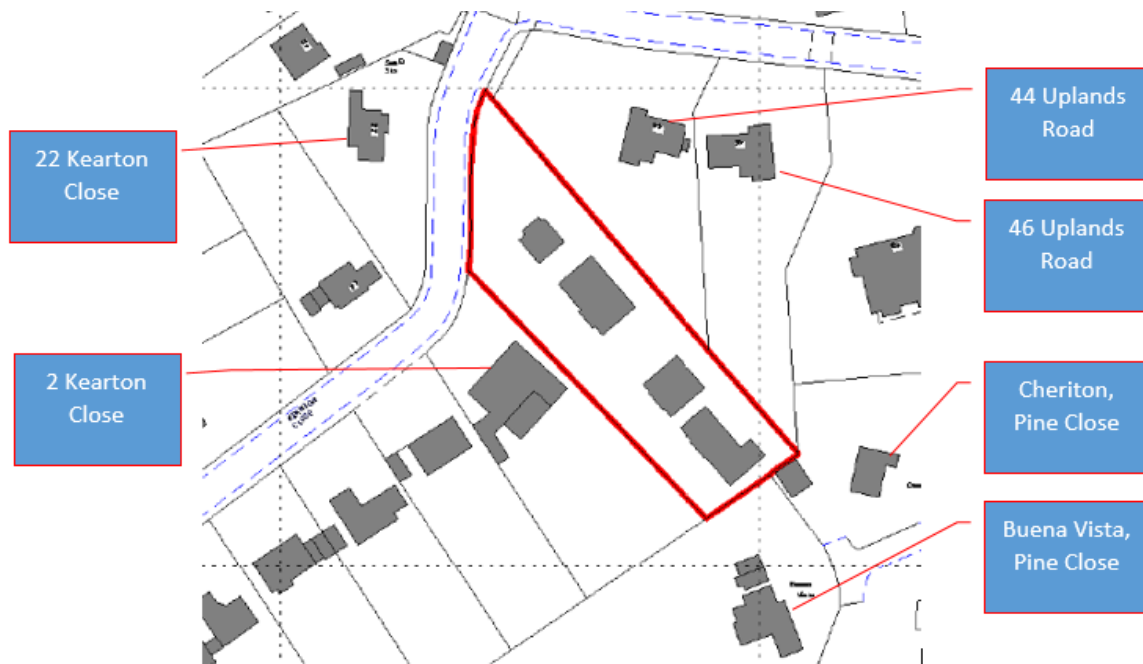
Block plan showing proposed dwellings and surrounding neighbouring properties
